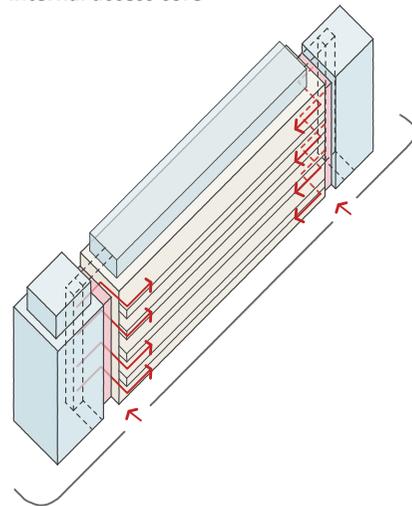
Additional storeys and extra units by providing new lift and escape stairs where existing building has deck access
